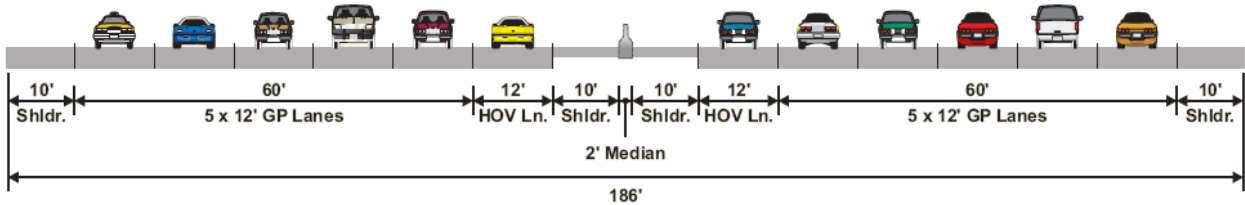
Typical Cross Section – Existing (Montrose Road to Spur)
